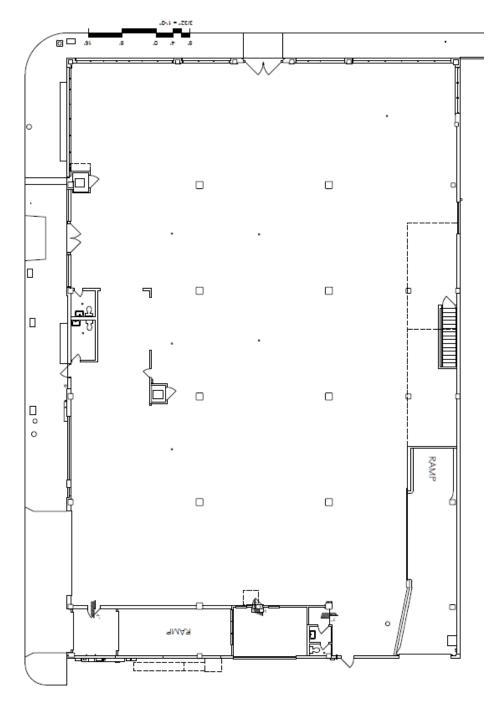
Existing First Floor Plan. Courtesy of Open Studio Architecture. N
